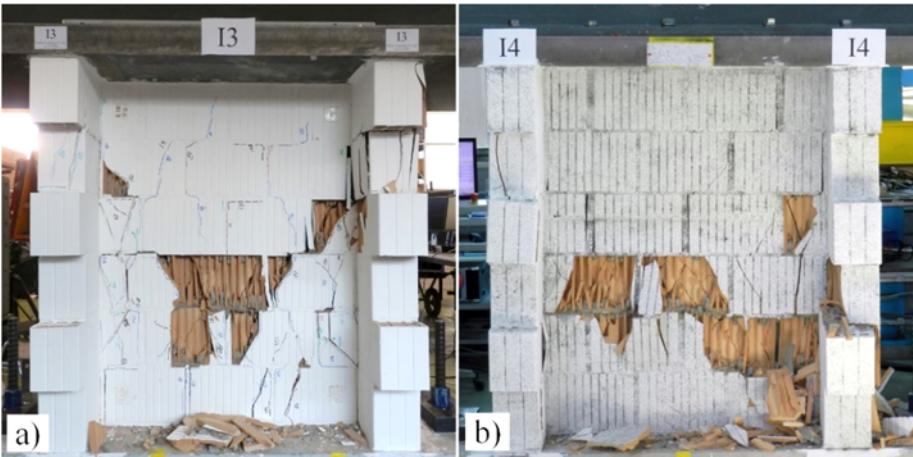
Crack patterns observed on the I-shaped wallettes of the first test series: a) Wallette I3; b) Wallette I4 [57]
